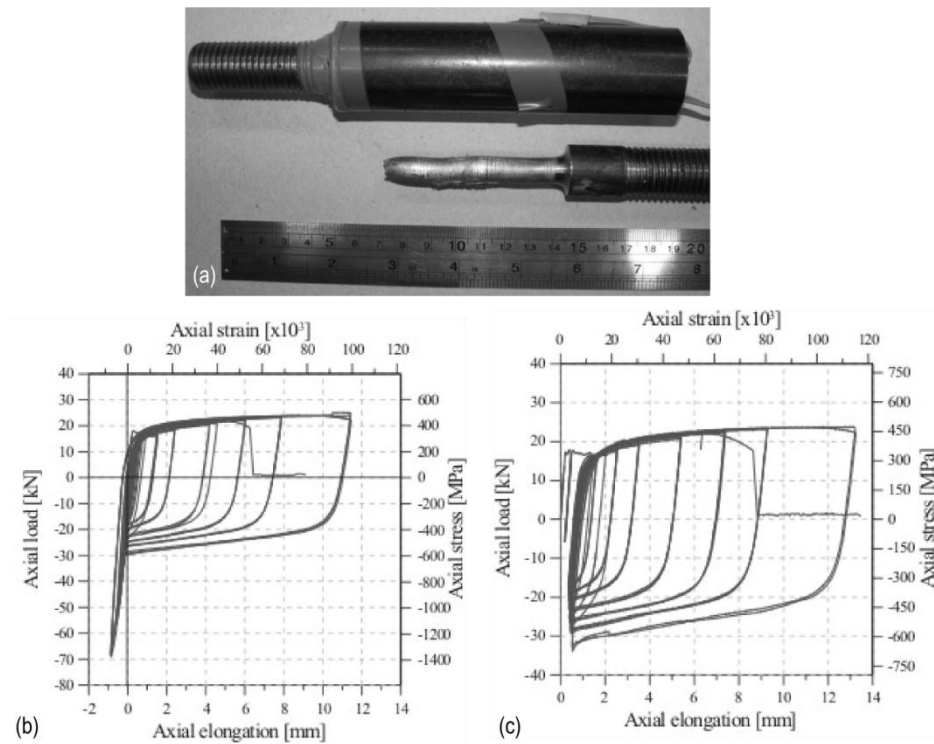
(a) Failure mode of TCY dampers; hysteresis loops for 8.0mm fuse dissipaters (b) non-symmetric and (c) symmetric load (Marriott, 2009).
